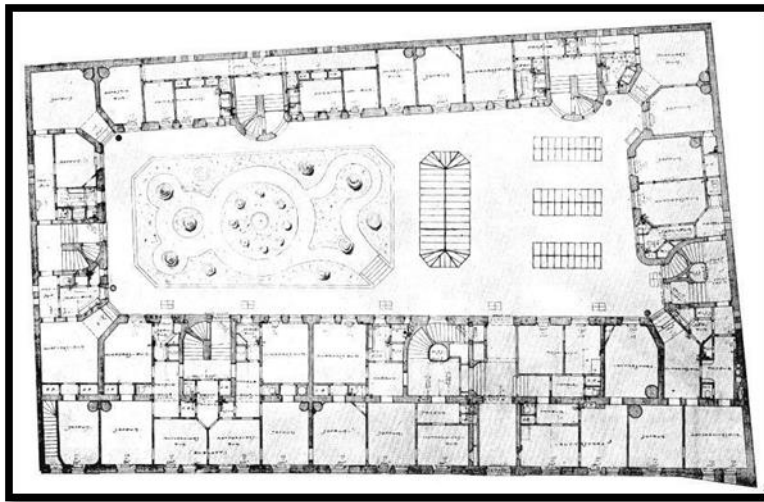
The floor plan of Hemgården in Stockholm, Design for Gender Equality.
